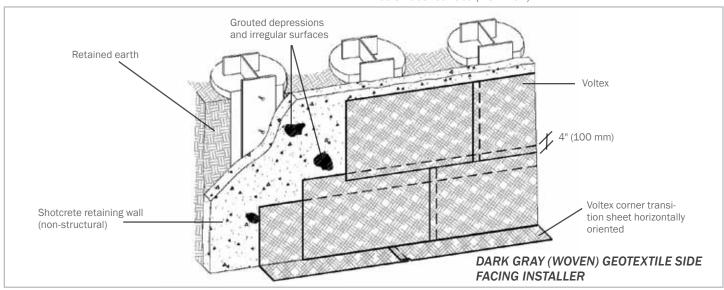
Voltex installation over an auger cast concrete retention wall prior to cast-in-place concrete wall.
